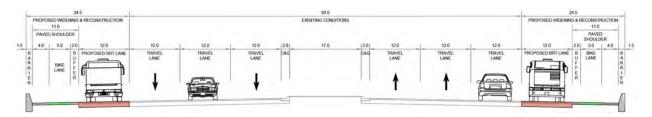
| BRT Alternative MacArthur Causeway Typical Section
